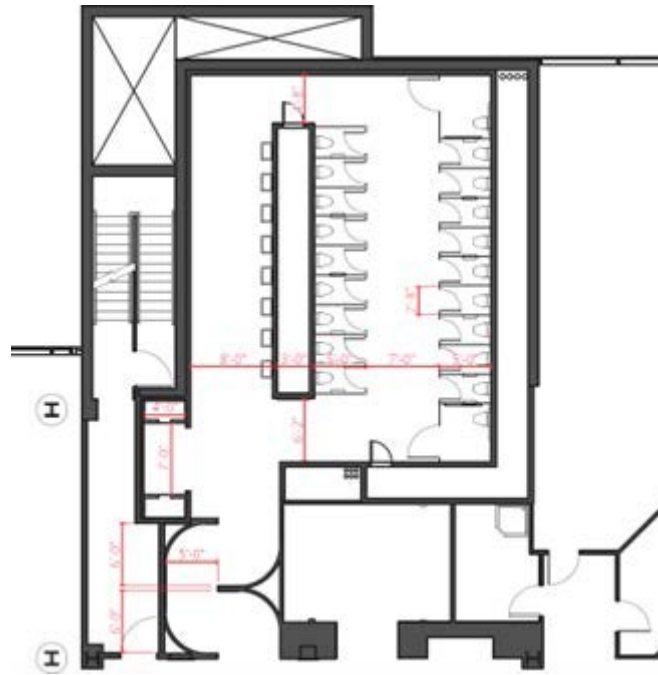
Example Existing Restroom Plan - Concourse B, Center Core
